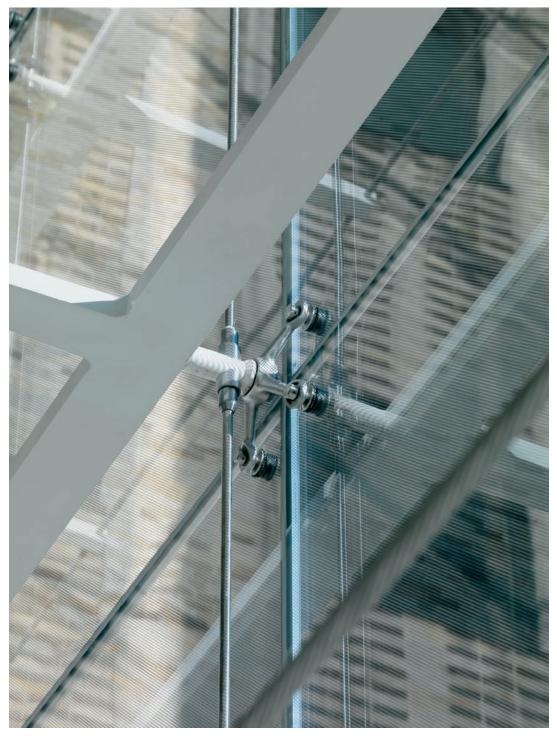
Detail of glass fixing on the atrium wall. Note the dead load rods.
